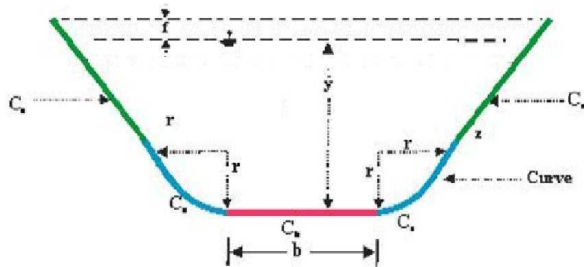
Trapezoidal Round Cornered section of Lined Canal with excavation and free board
